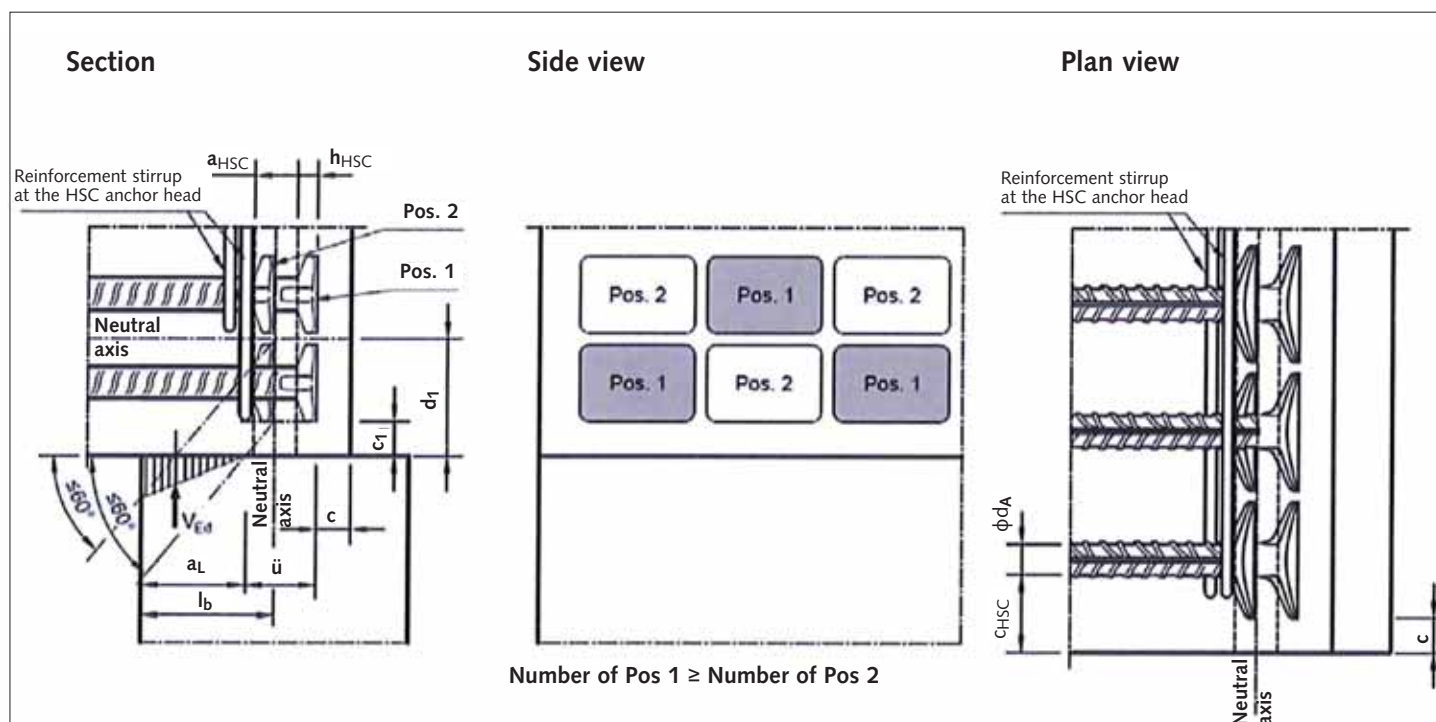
Arrangement of two-layer staggered HSC Anchors with triangular support stress; example
